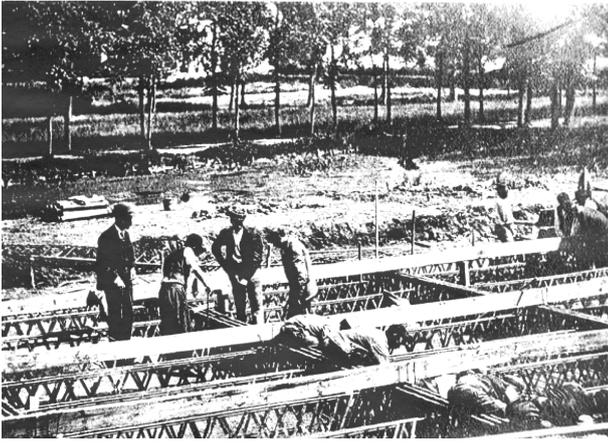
Vuurmolen. Foundations in reinforced concrete of the flour-mill at Overijse in summer 1902 (Photo Archive R. De Coster)
